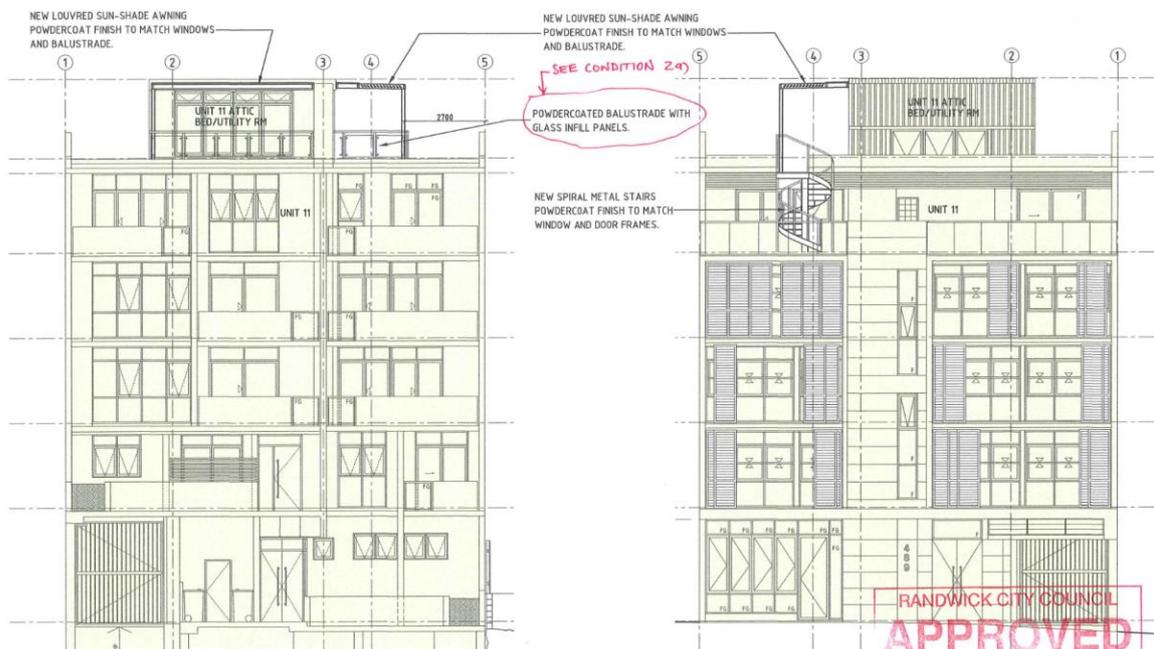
No. 489 – approved east and west (Bunnerong Rd) elevations – DA/873/2015 (Source: RCC)
